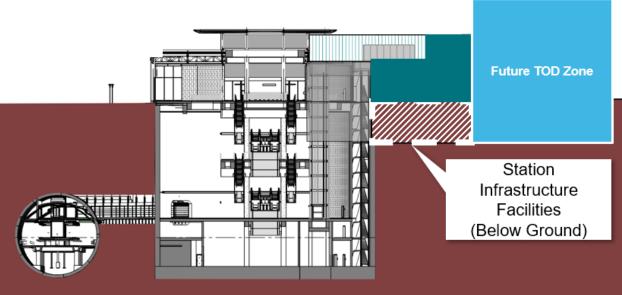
Diridon BART Station – Draft Sketch (Site Plan and Cross Section) of Station Infrastructure
